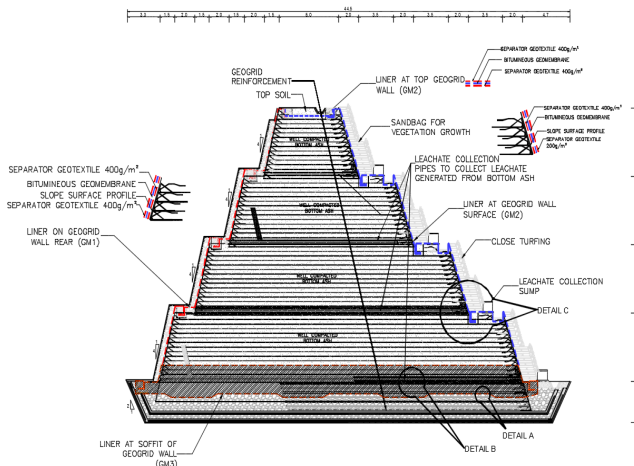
Case 1 – Propose utilization of bottom ash for geogrid wall construction
